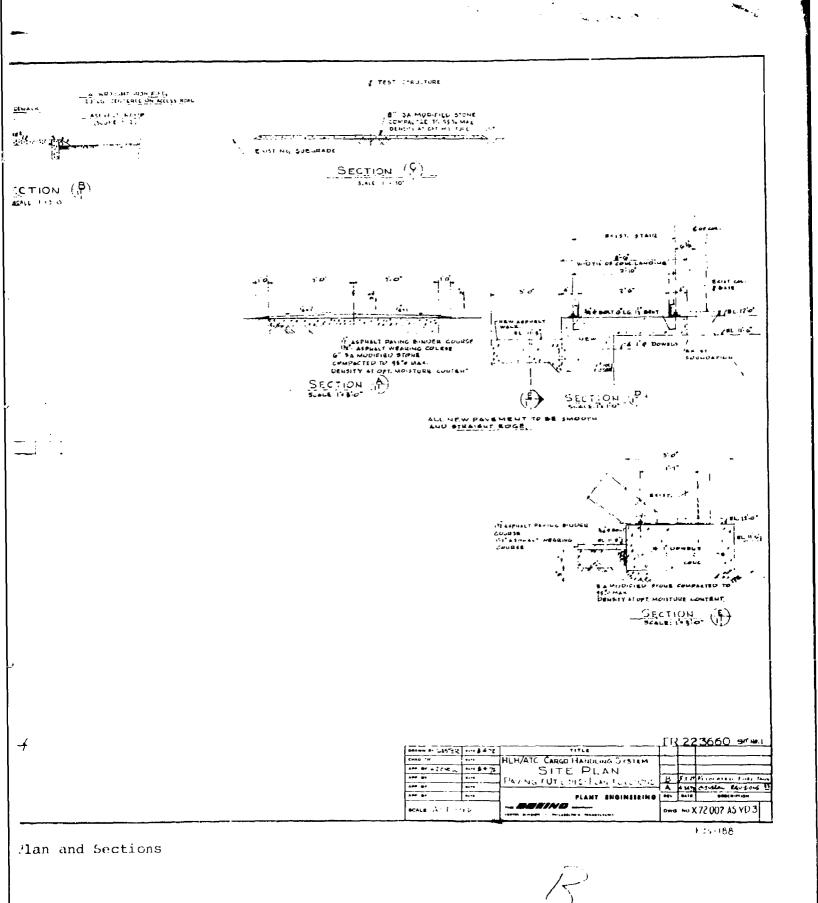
Site Plan - Paving and Utilities, Plan and Sections
